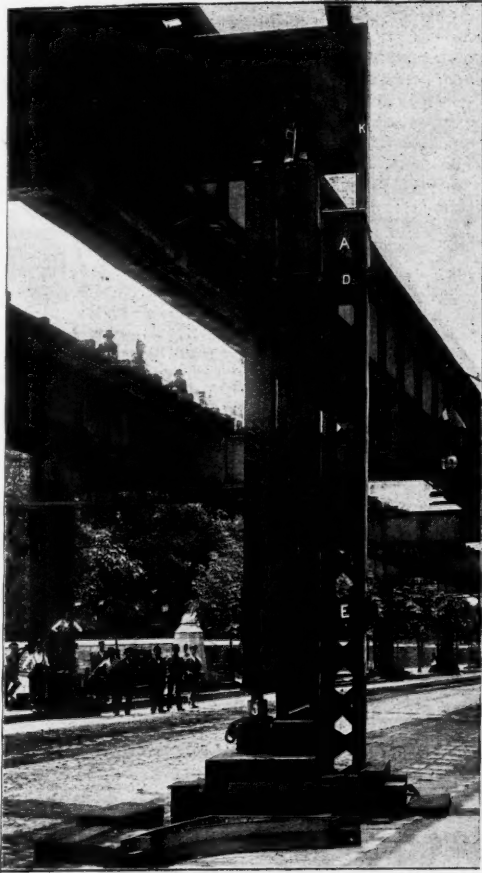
Lowering Grade of Brooklyn Elevated Railroad.
